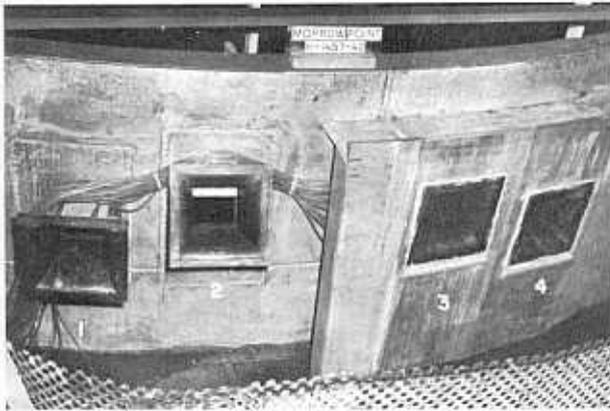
Upstream face of dam showing modifications to spillway entrances:
